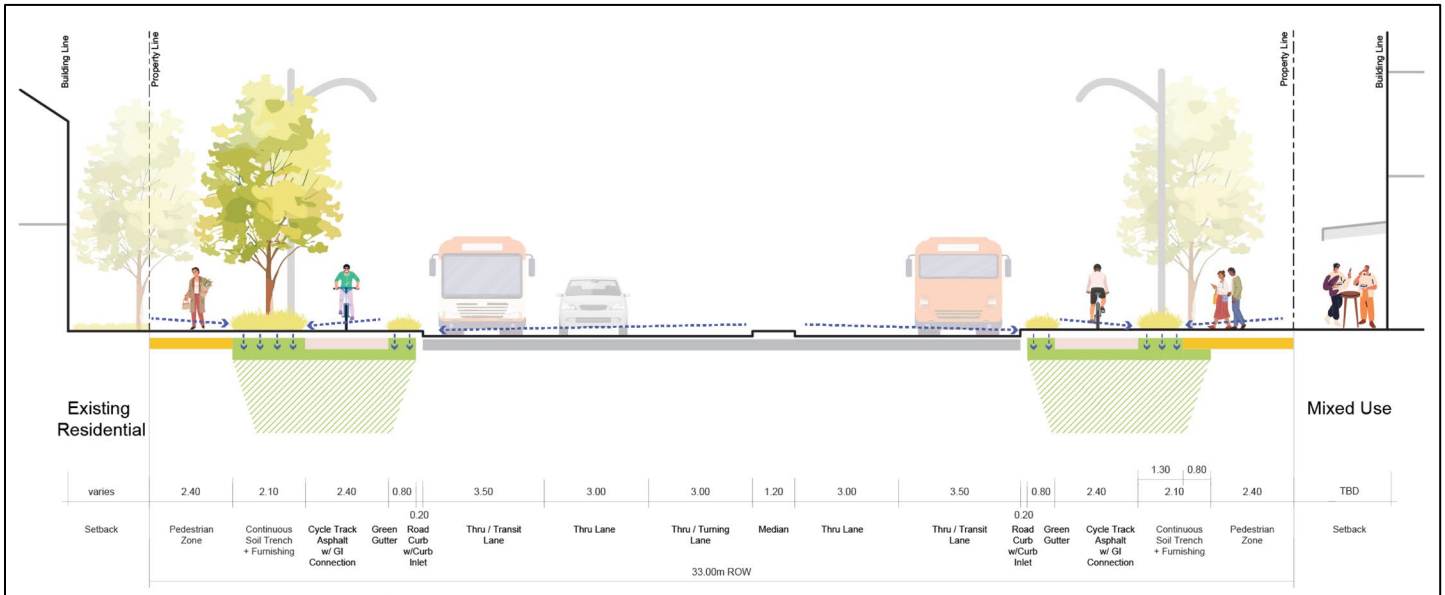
Existing Dufferin Street (Highway 401 to Wilson Avenue) Cross-Section - Option 1
